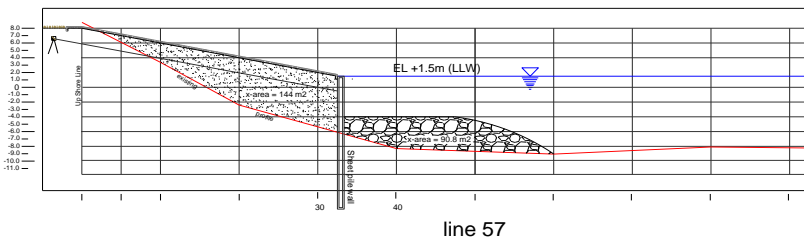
Designed Slope vs. Typical Existing Transverse Profiles
